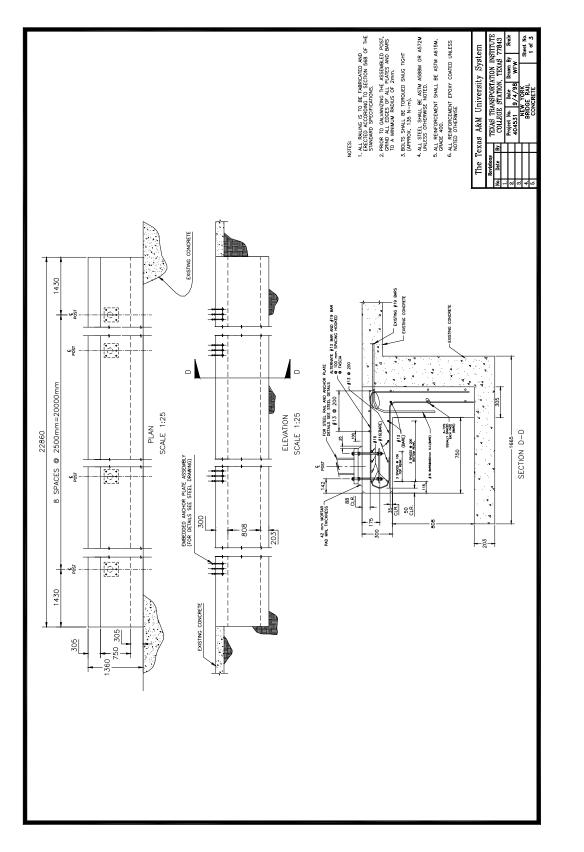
Details of the New York Four-Rail Curbless Bridge Railing used for tests 404531-4 and 6.
